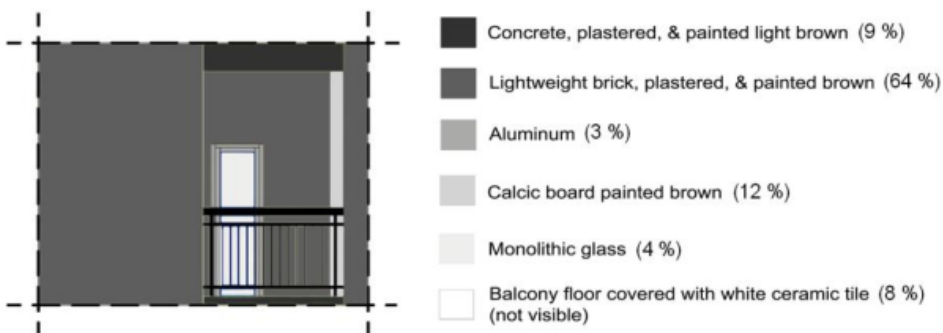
Façade of apartment units with glass door in a small balcony (B apartment).
